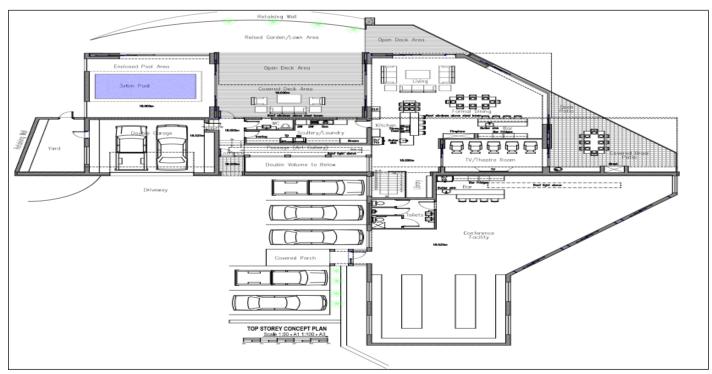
Concept plan for the first floor of the proposed conference centre and tourist facilities (TMBA, 2023)
